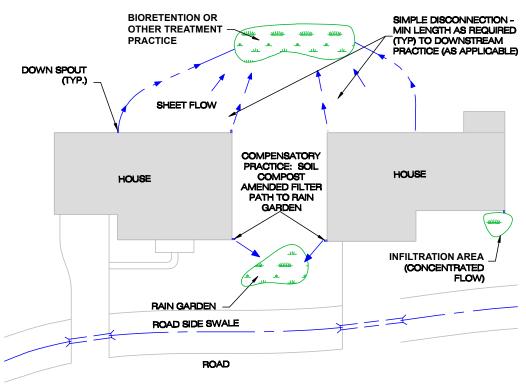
Residential Rooftop Treatment – Plan View (Source: WVDEP).
